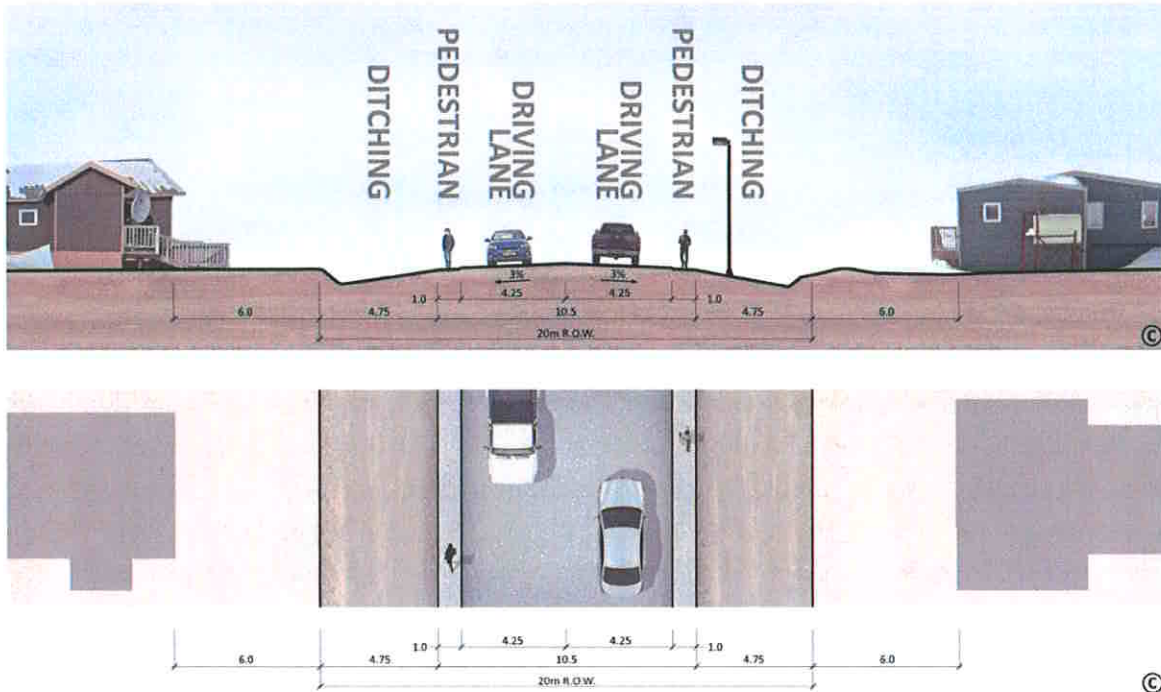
& 2: Cross-sections for Road To Nowhere (Collector Road)
